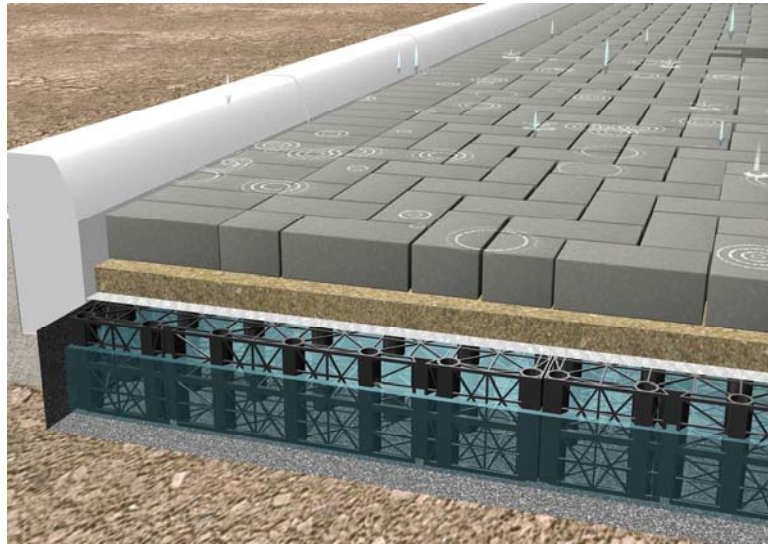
Permeable pavement surface with a stone reservoir underneath (from TecEco, 2009).
